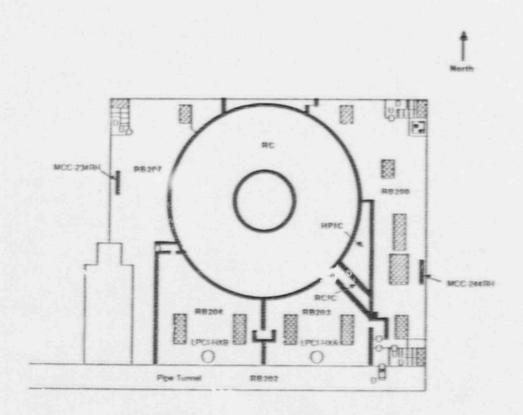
Limerick 2 Reactor Building, Elevation 200'
